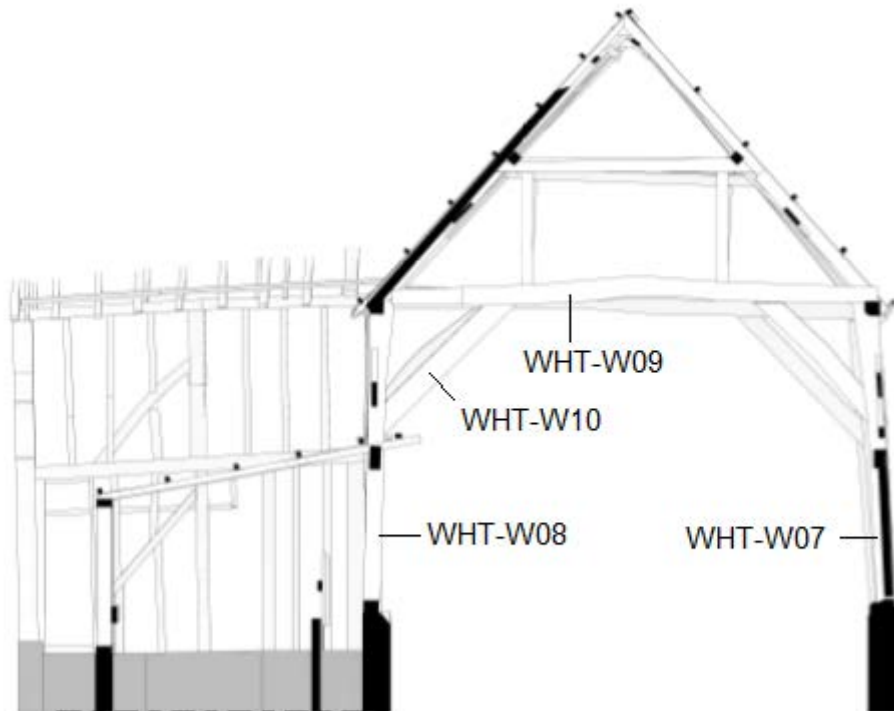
Section through Truss 3, east face, showing the sampled timbers, WHT-W07-10 (after ATD London Ltd)
